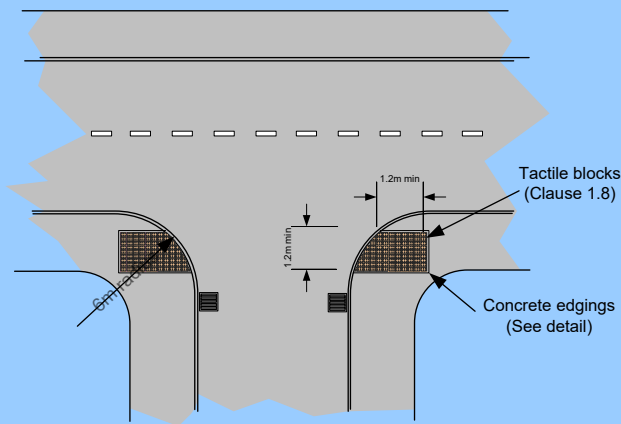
/1b - JUNCTION DETAIL WITH PERVIOUS PAVEMENT
